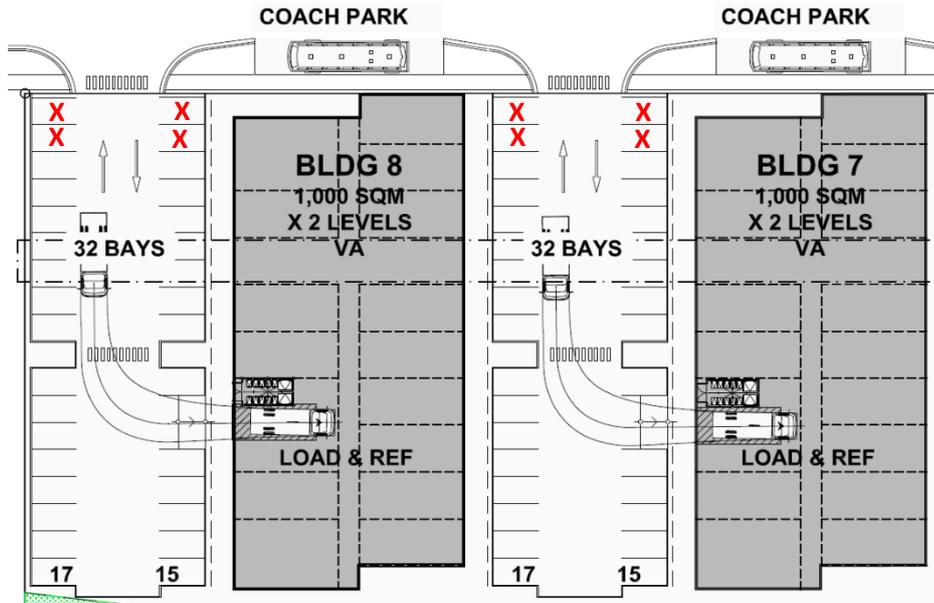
Parking Spaces to be Removed to Create Queuing Space
